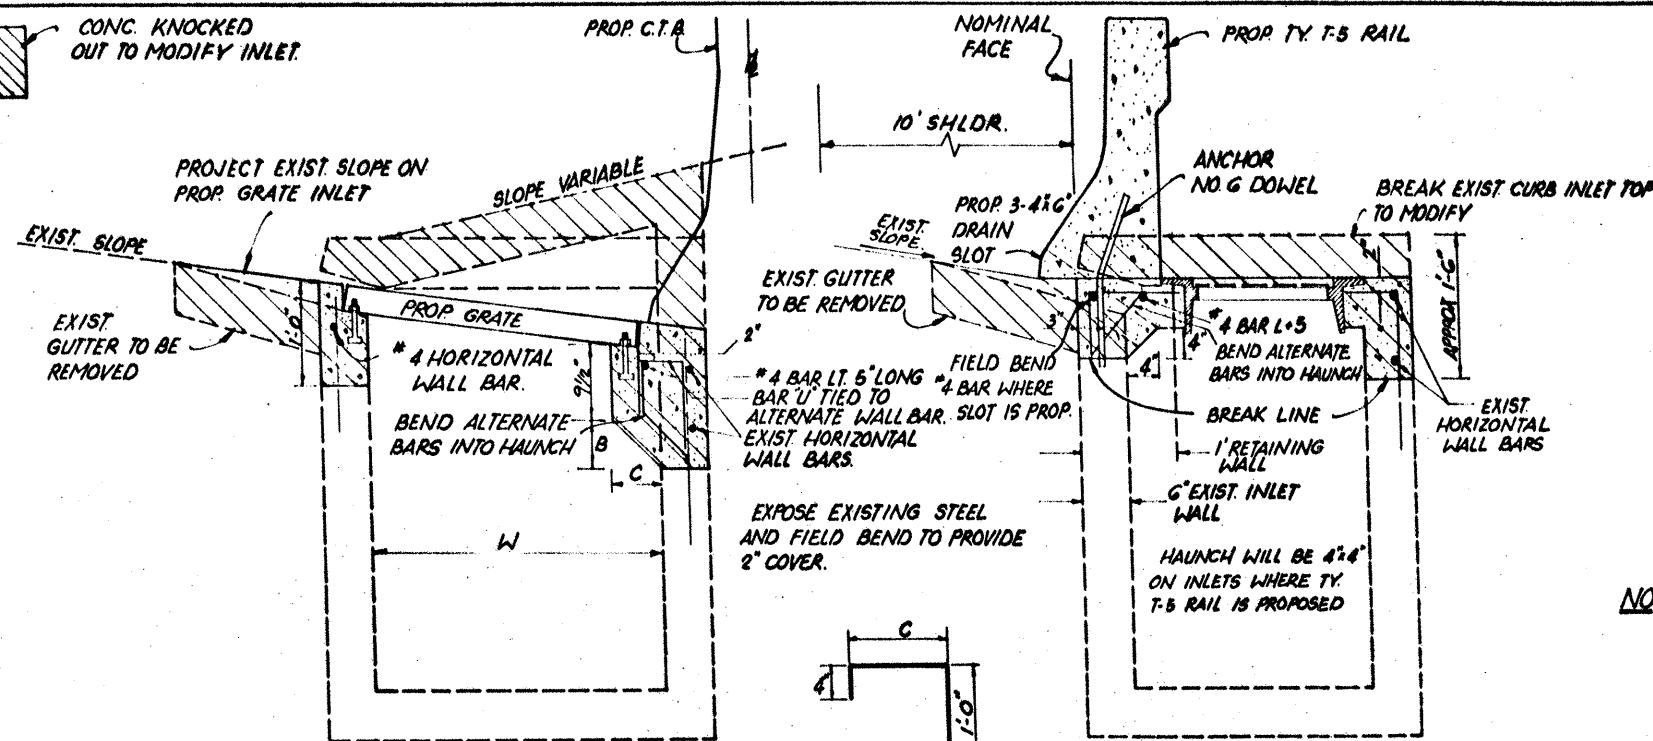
DETAILS AT RAMP NOSES & OLD CONCRETE REMOVAL
